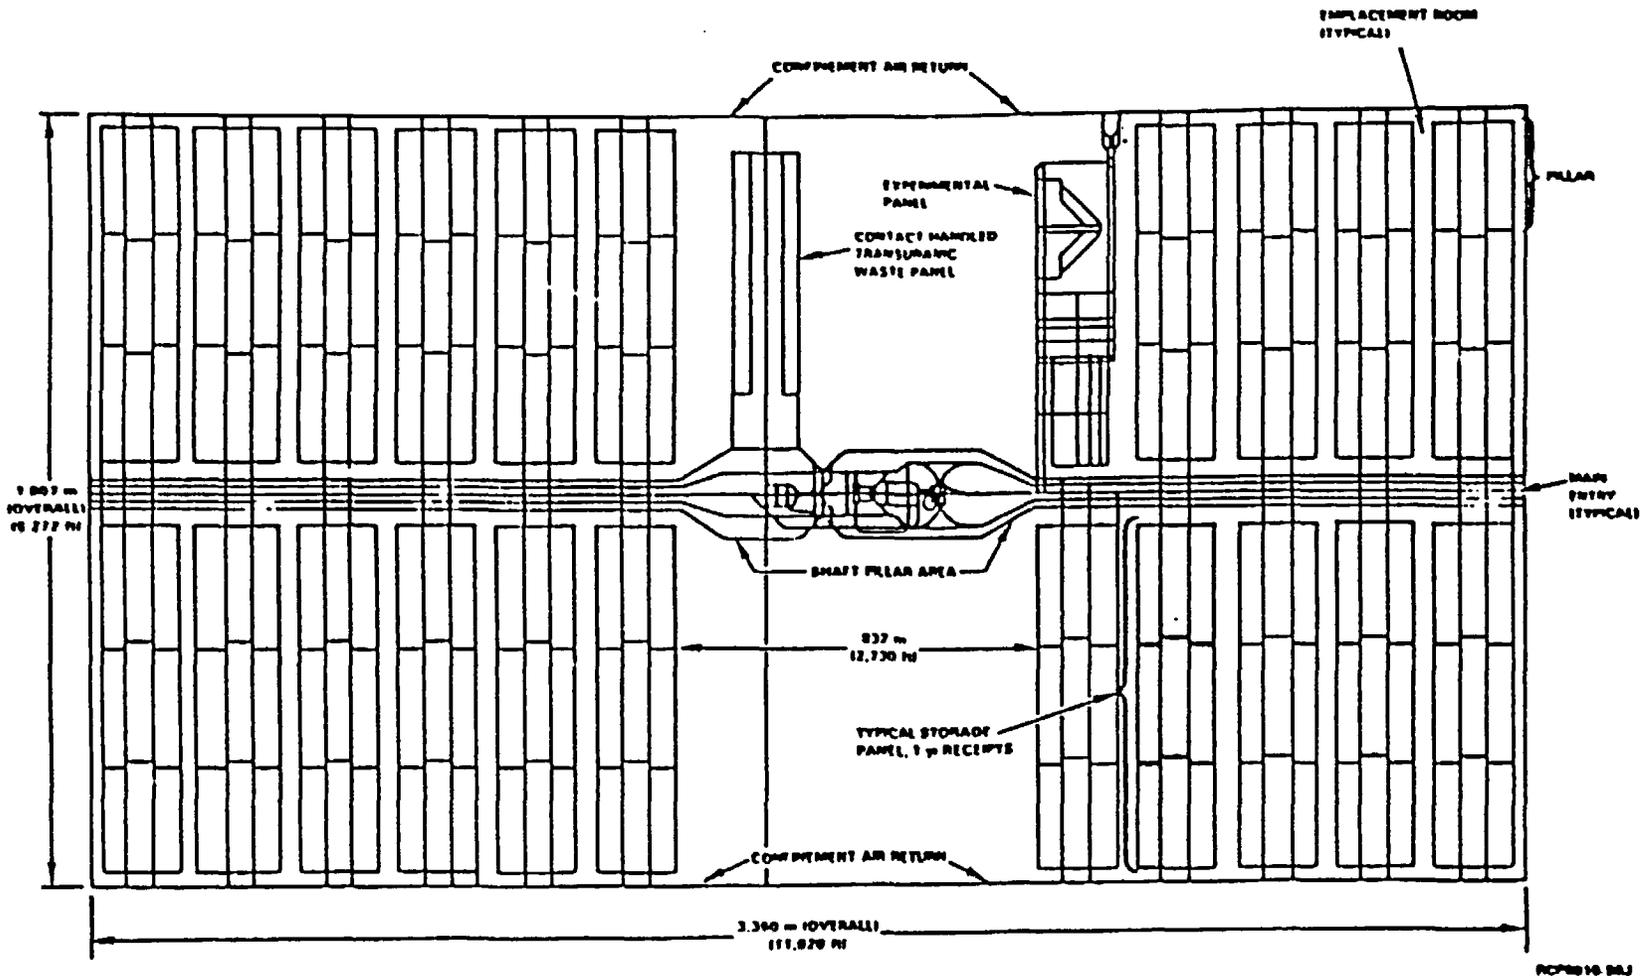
THE 1982 CONCEPTUAL DESIGN UNDERGROUND FACILITIES LAYOUT (RKE/PB, 1983)
